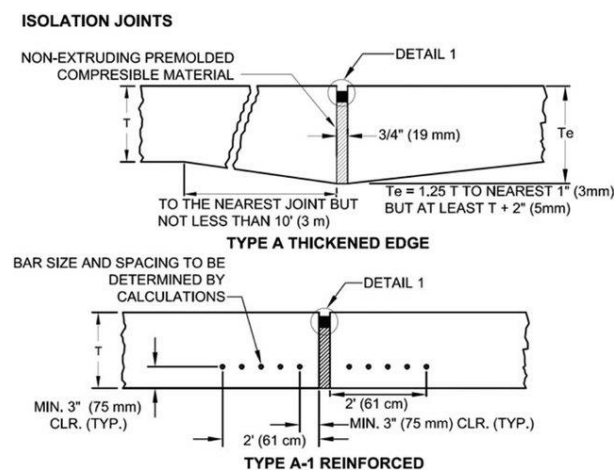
Section view of a typical isolation joint (Source: Cunliffe et al., 2016)
